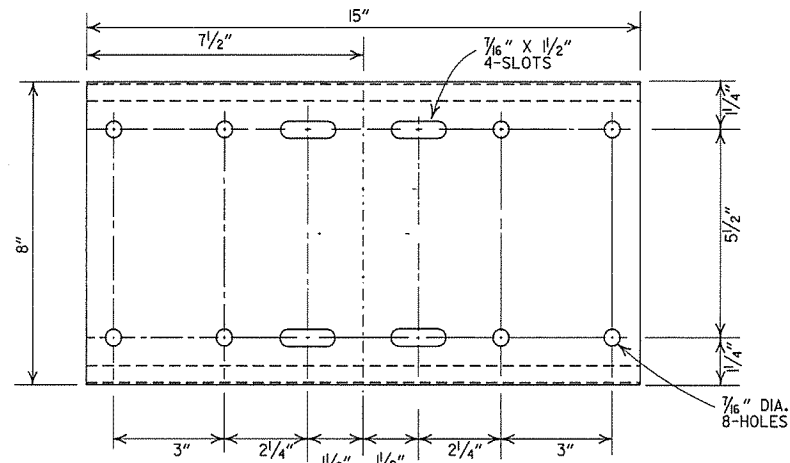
DETAIL OF TERMINAL ANCHOR POST (TYPE I)
